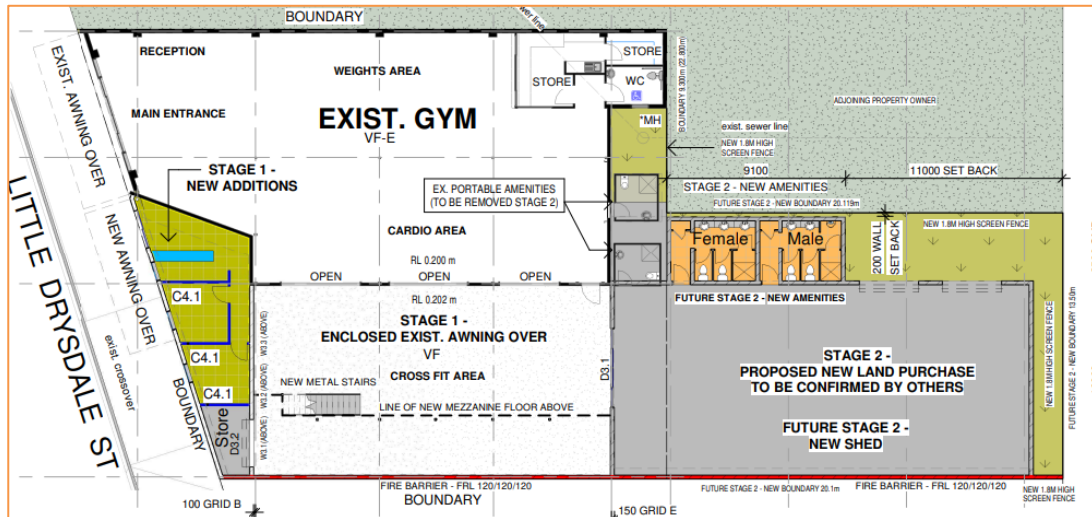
Master Floorplan. Source: Burdekin Building Design.
